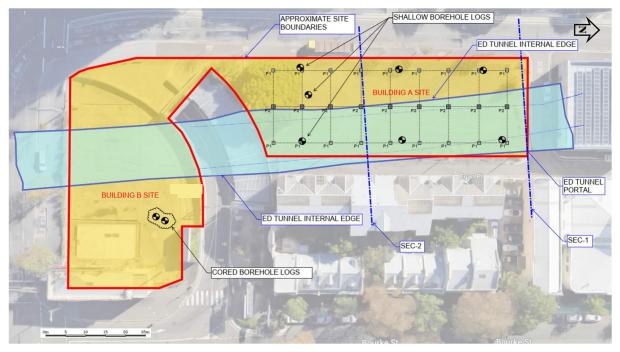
Location of existing geotechnical investigations, building column positions, and FE analysis sections
